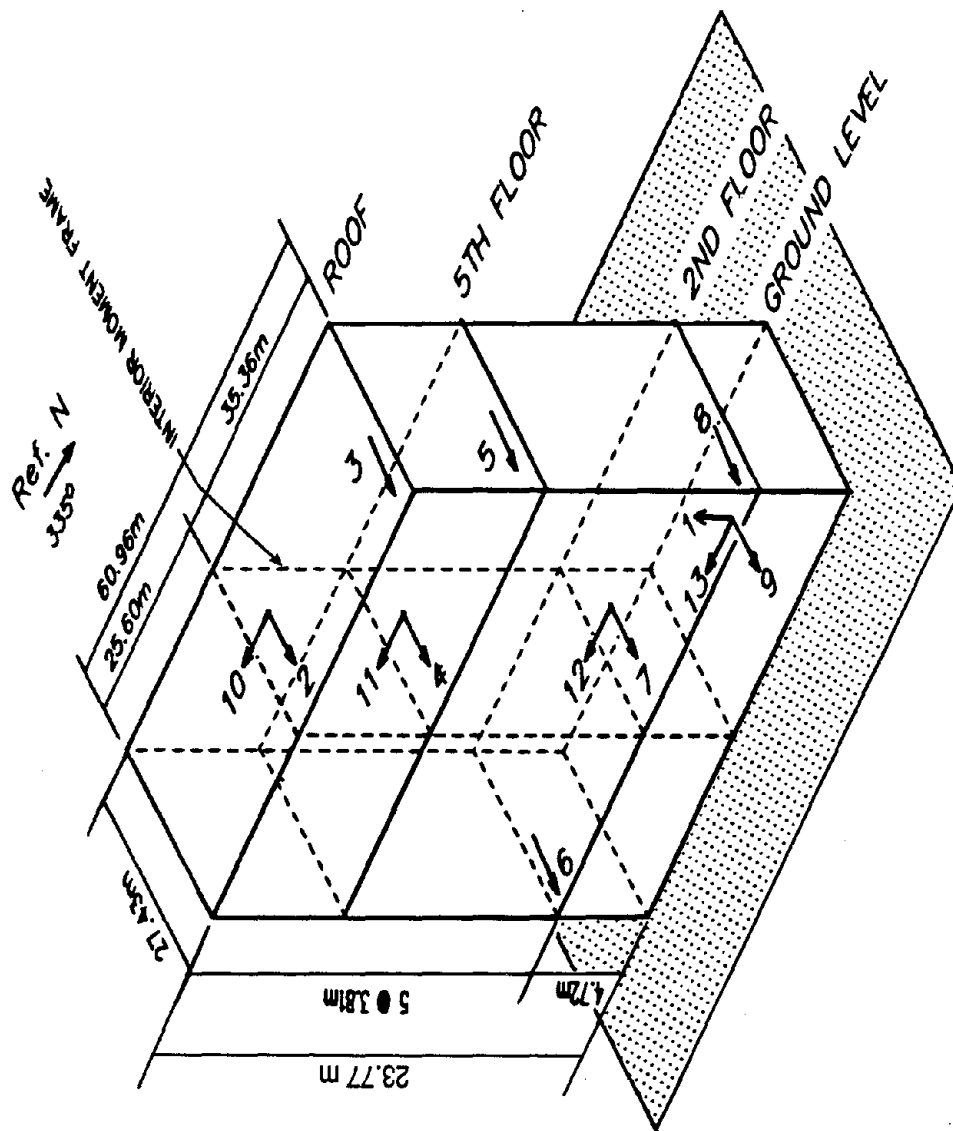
Existing Instrumentation Scheme in the San Bruno Commercial Office Building.
